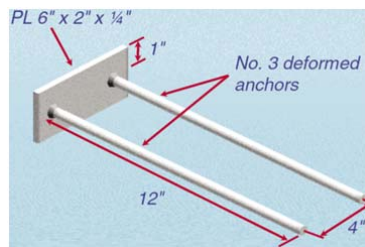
details and dimensions of the stud-welded anchor and plate connectors (2 in. flanges)
